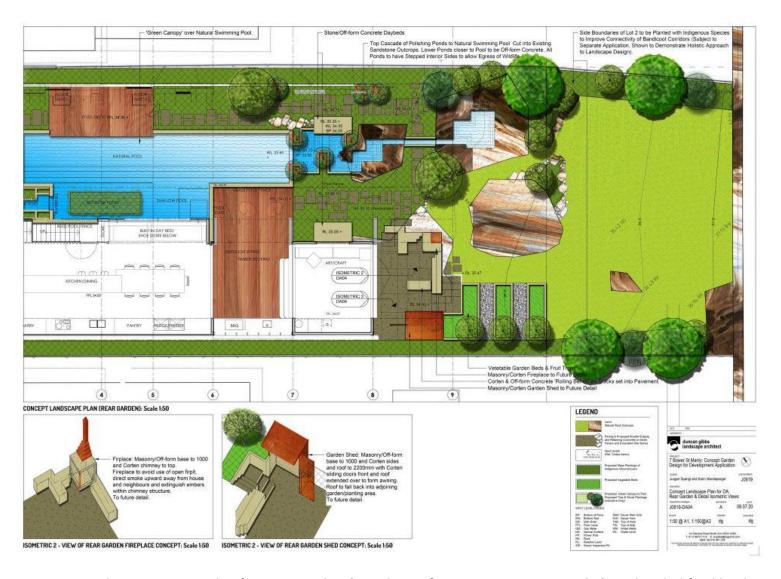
Landscape Concept plan for Rear Garden & Pool Area for 7 Bower Street, Manly (see detailed final landscape plans from Duncan Gibbs Landscape Architect 8/07/2020)
